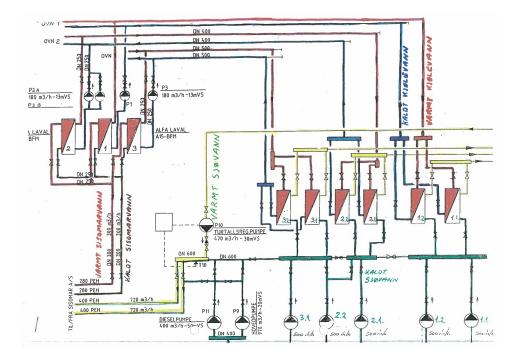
Shows a detailed overview of the layout for the heat exchanger building[16].
